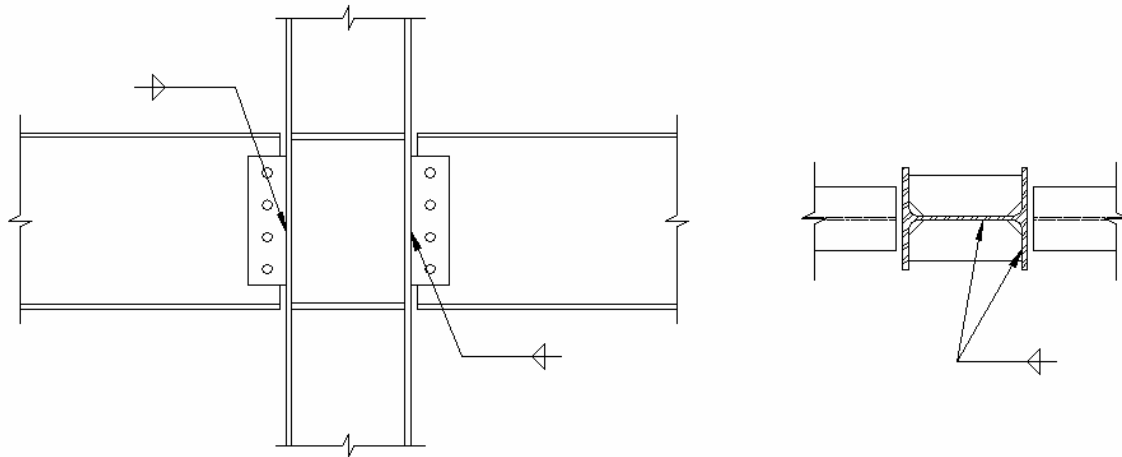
Typical girder to column shear tab connection shown with stiffener plates
